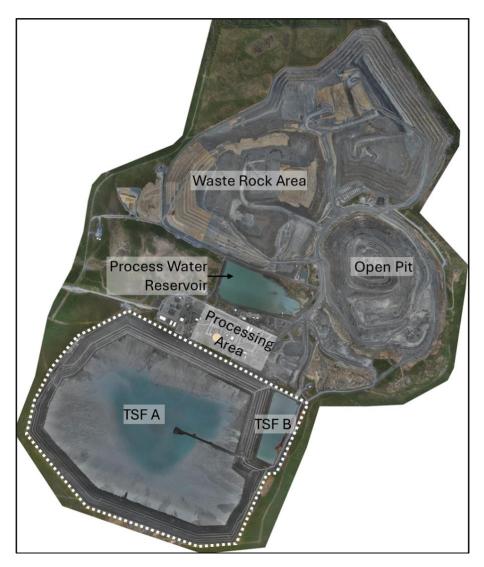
Aerial photo (2024) of the Kevitsa mine – The tailings facility area located within the dotted line
